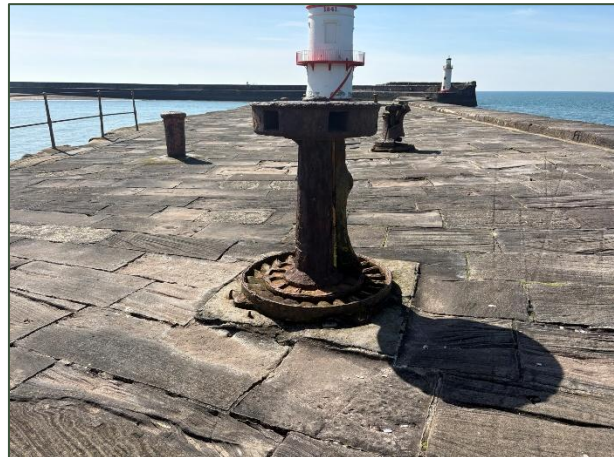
19th century North Pier, original flagstone flooring is more significant that the flooring to be directly impacted within the North Wall and Old North Wall.
